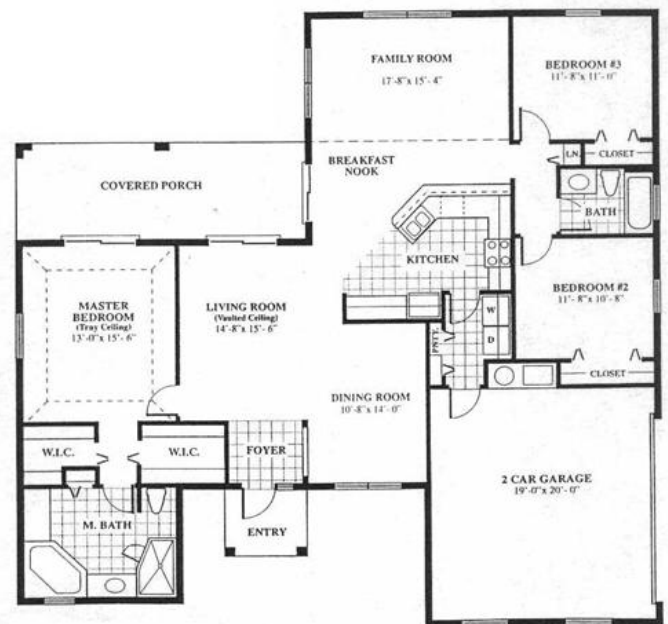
Floor plan of case study house in Jacksonville, Florida.
